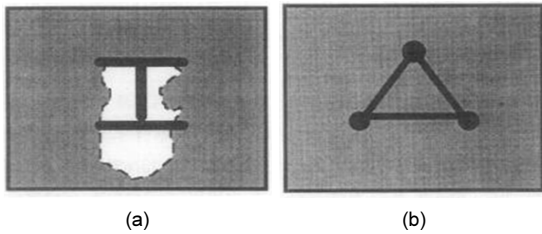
Void of surrounding steel rib after placing shotcrete : (a) H-beam steel rib; (b) Lattice girder (Bae et al., 1996)
